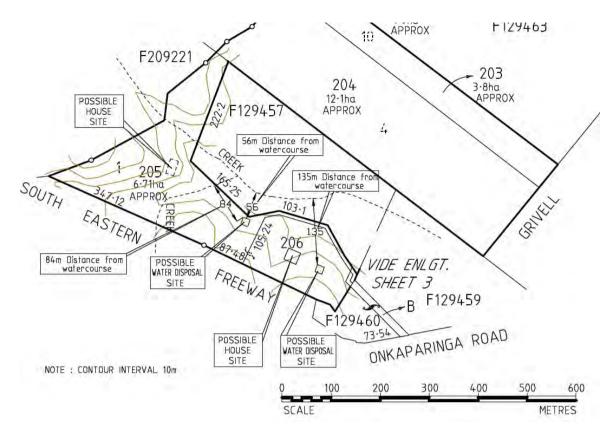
Proposed site development plan showing two house location options (supplied by Veska & Lohemeyer Pty Ltd, September 2014)
